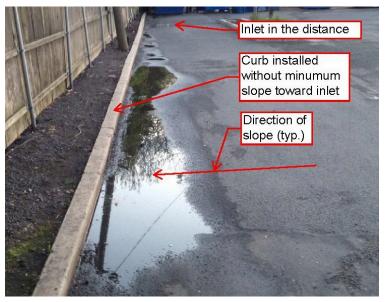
(Picture of Curb Installed Without Minimum Slope)
